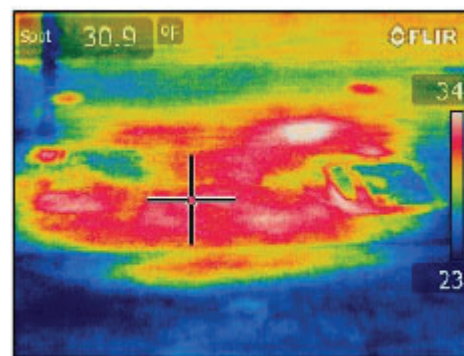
Scan of small area of wet insulation on roof of Smith Building #3
